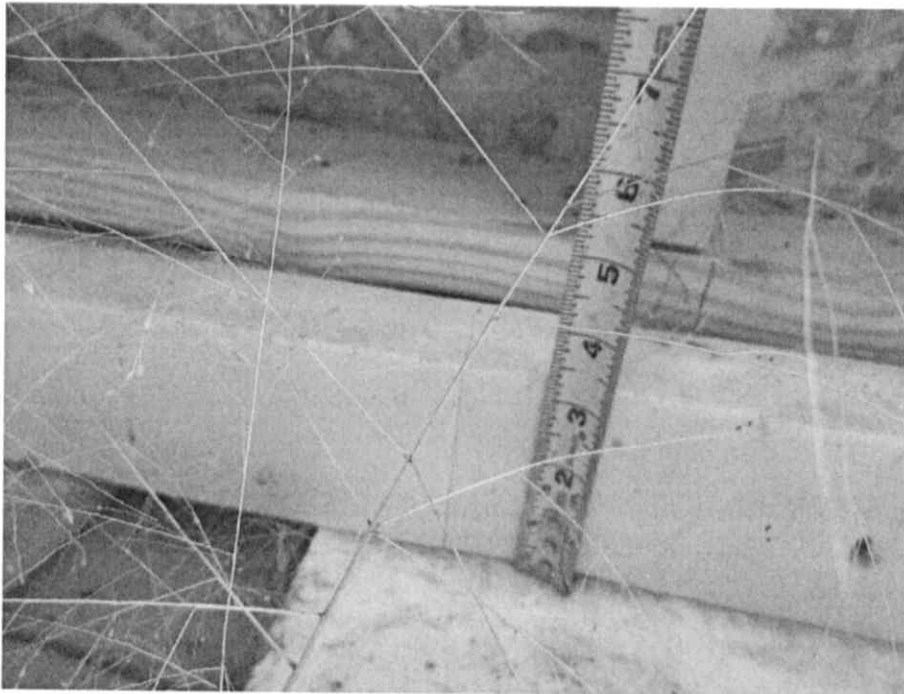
View of a basement floor location where the top surface of rigid insulation on the ground was 3 inches below the top of exterior foundation wall.
